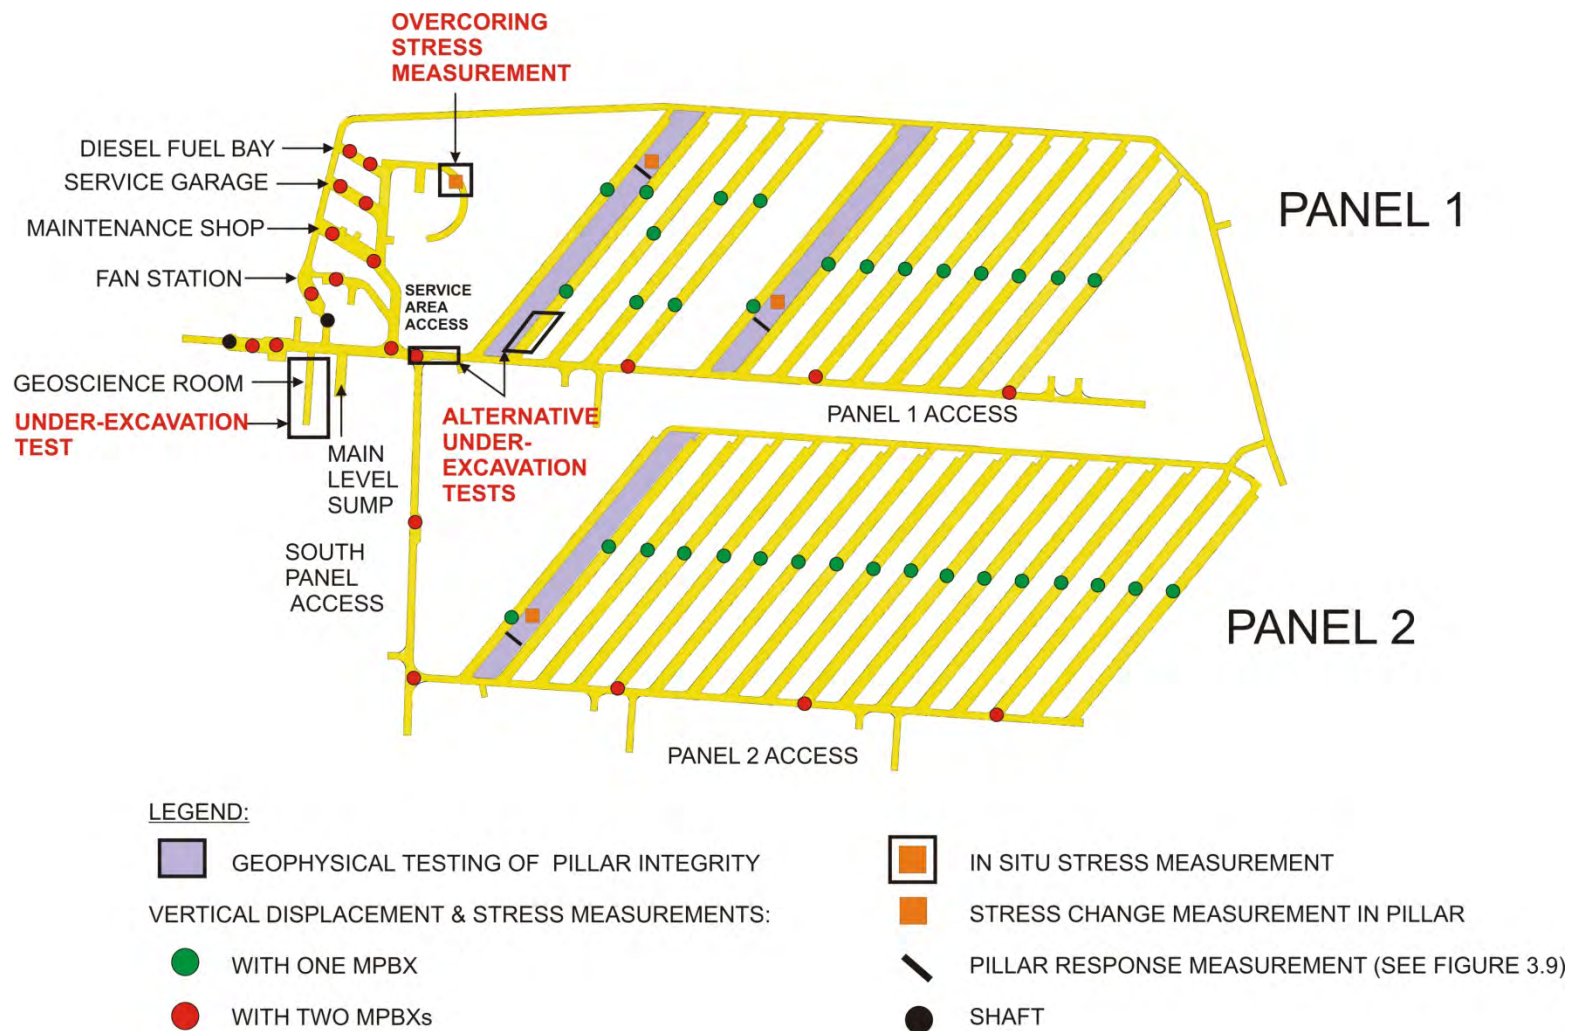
Plan View of Underground Repository Showing Location of Verification Activities
